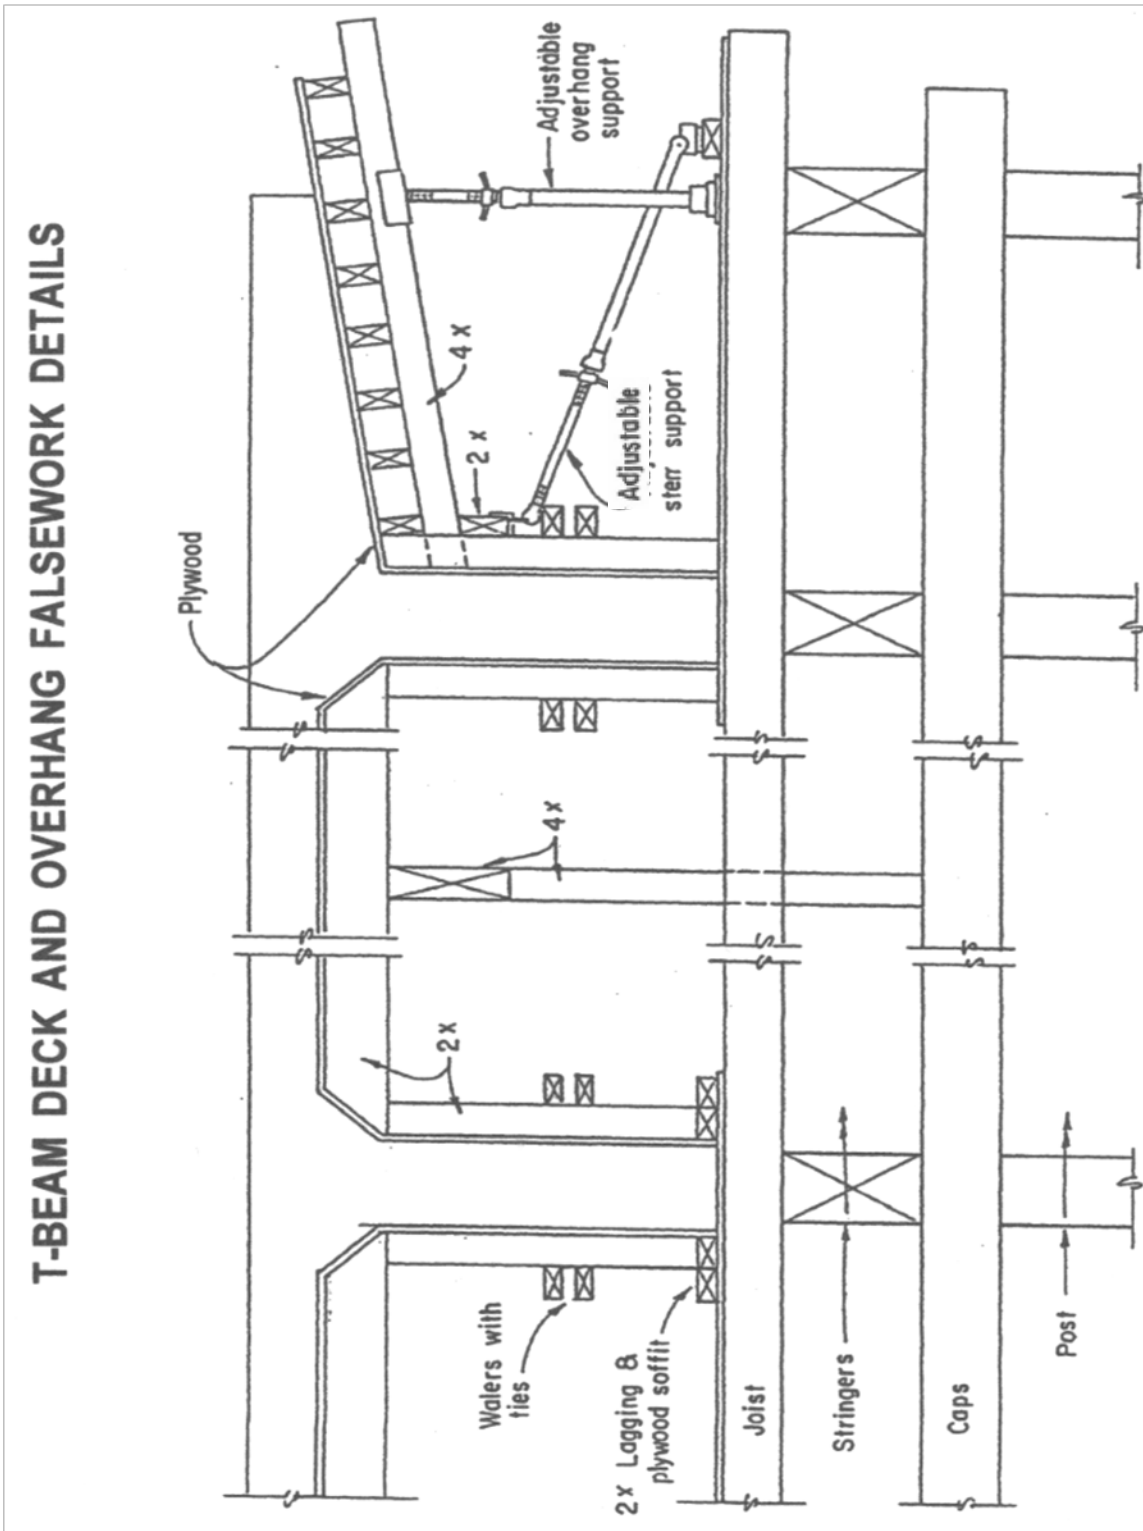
Sample T-beam and Overhang Falsework Details.
